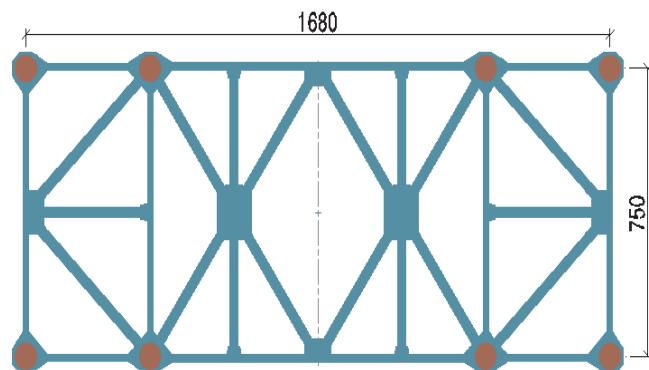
Cross section of steel tubular truss at the arch crown (unit: cm)
